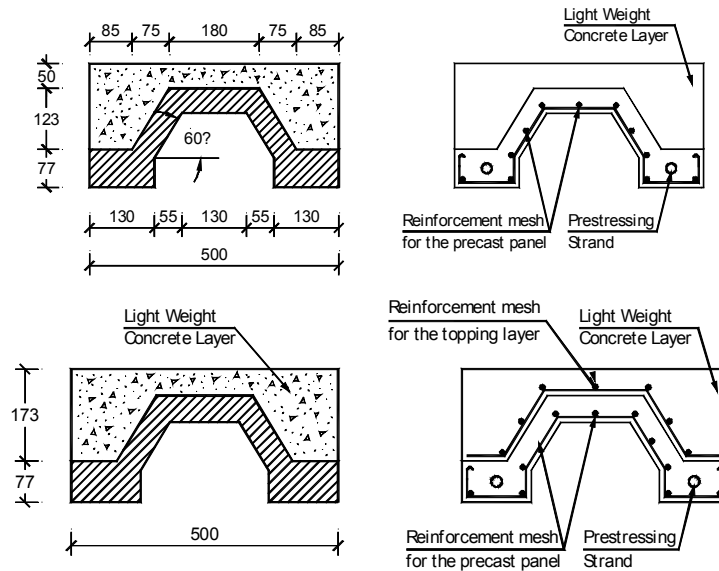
Dimensions and reinforcement for all slabs (all dimensions are in mm)
